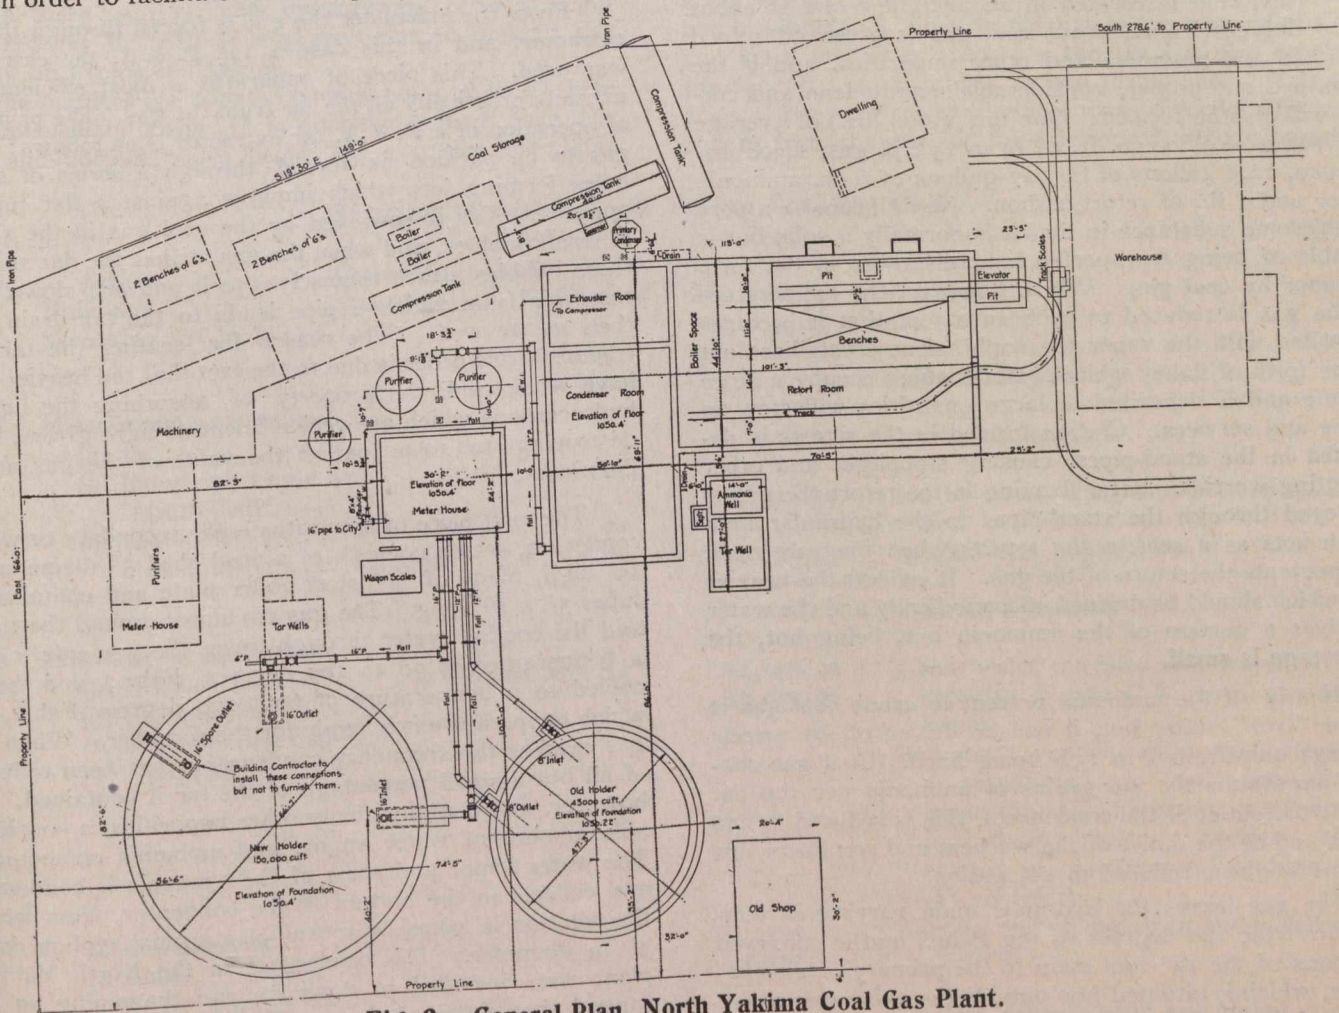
General Plan, North Yakima Coal Gas Plant.
